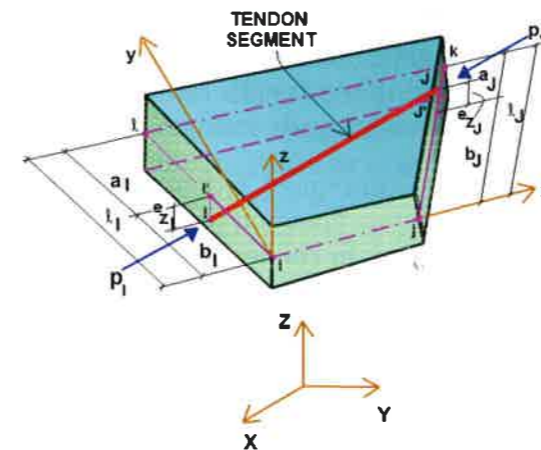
Representation of a Slab Element with Embedded Reinforcement (P556)
